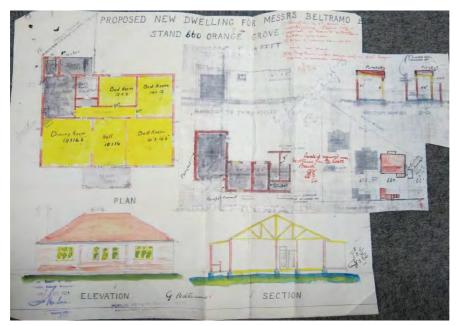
Plan for proposed new houses on Stand 660, Orange Grove from 1926 Good example of three bedroomed single storey residence with corrugated iron roofing and centrally located front stoep
